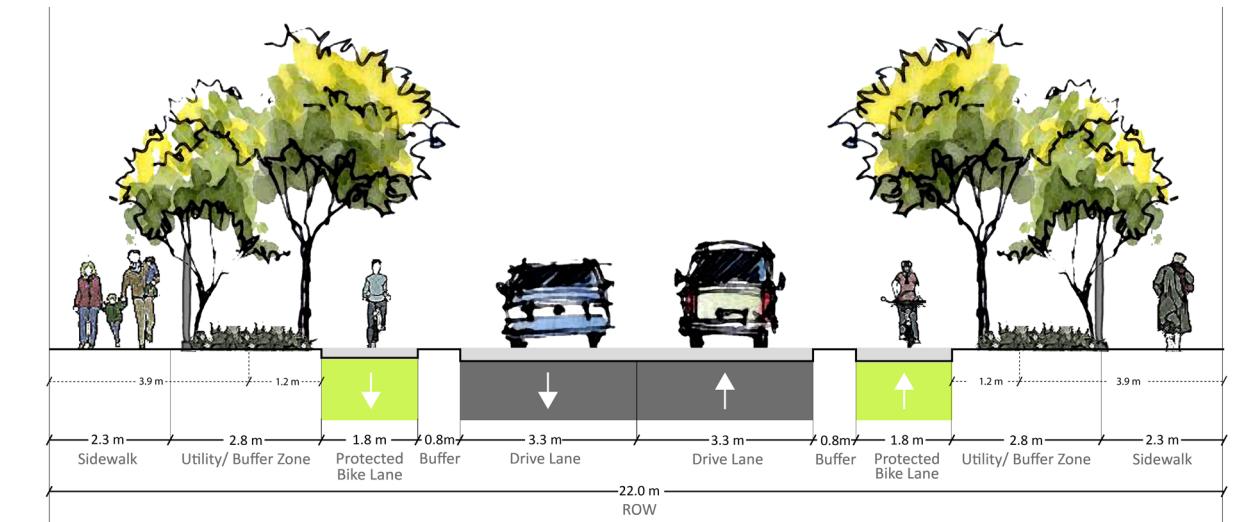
Proposed Kapyong Minor Collector Street Network
